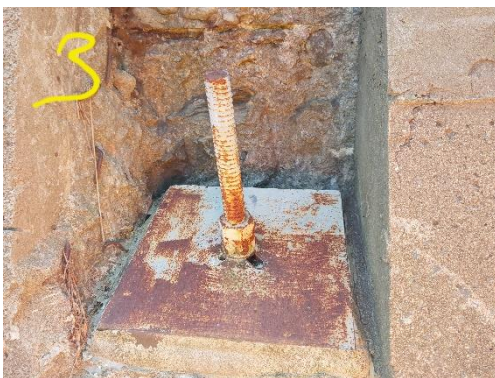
Post Tensioned Anchor #1-4 Starting at Exposed Part of Left Dam Section
